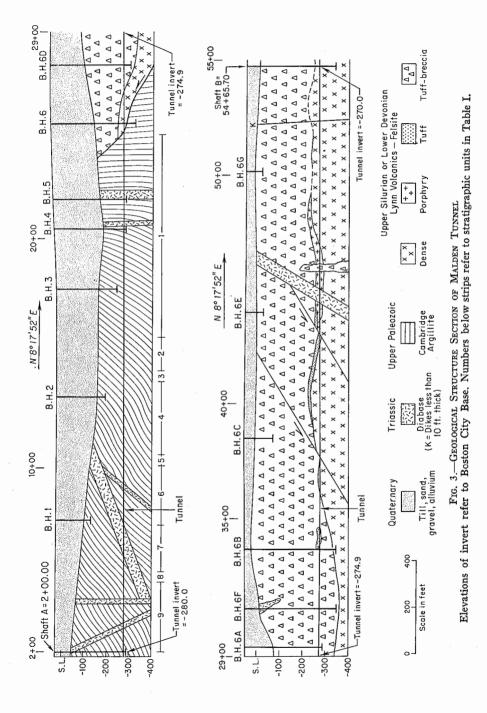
represents the geological structure along the line of the tunnel. It indicates the geology as it would appear on the west wall of a trench looking west, somewhat over 400 feet deep. Although considerable generalization and interpretation has been necessary, the section shows the thickness of the overburden (Quaternary), as well as the structure of the bedrock. Of course, the only "facts" are those observed in the tunnel, bore holes, and shafts. Shears and gouges, shown on the maps, have been omitted. Any upward or downward projection of these features would be largely conjectural. Moreover, an attempt to show them on an earlier version of Fig. 3 confused rather than clarified the diagram.
